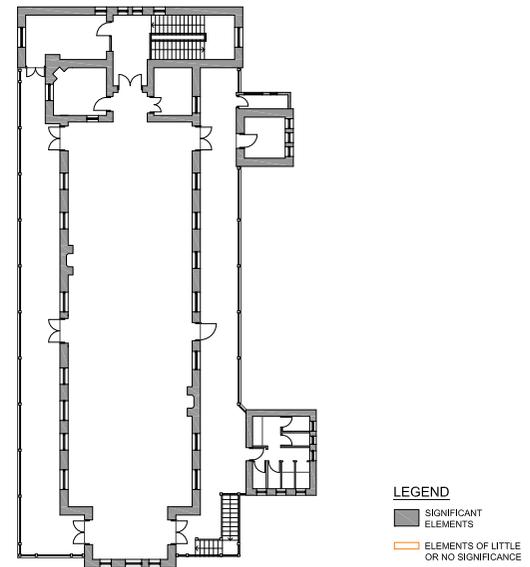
F - CROWLEY HOUSE FIRST FLOOR
